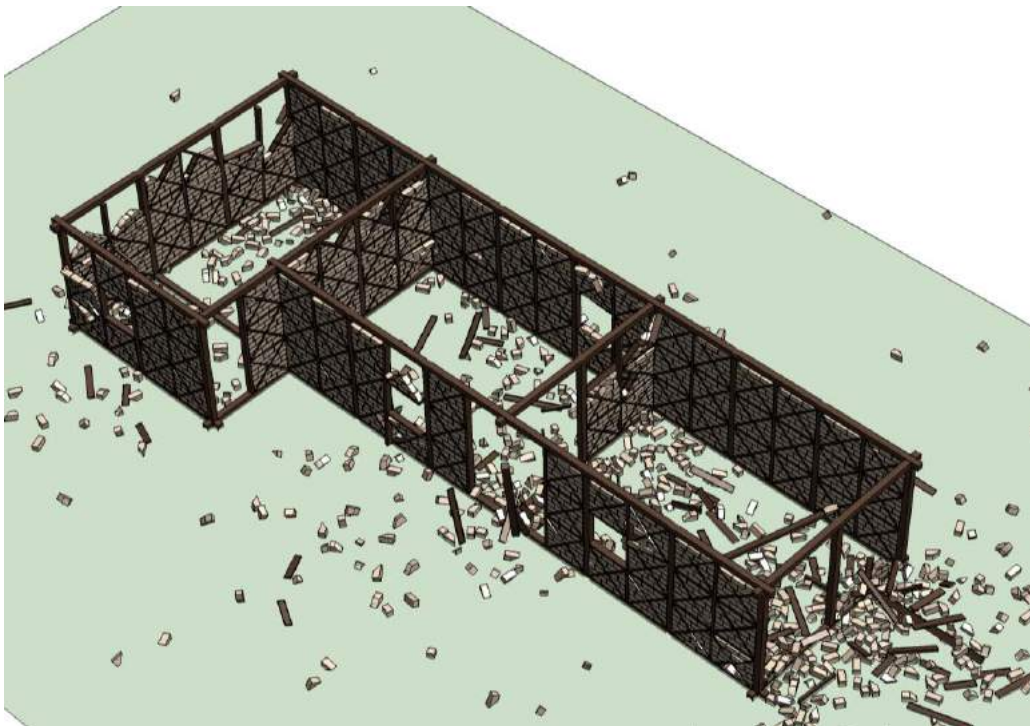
Damage to walls of Dhajji without nailed connections (PEER 828, tri-directional earthquake, See Appendix D7). (Roof not shown for clarity).
